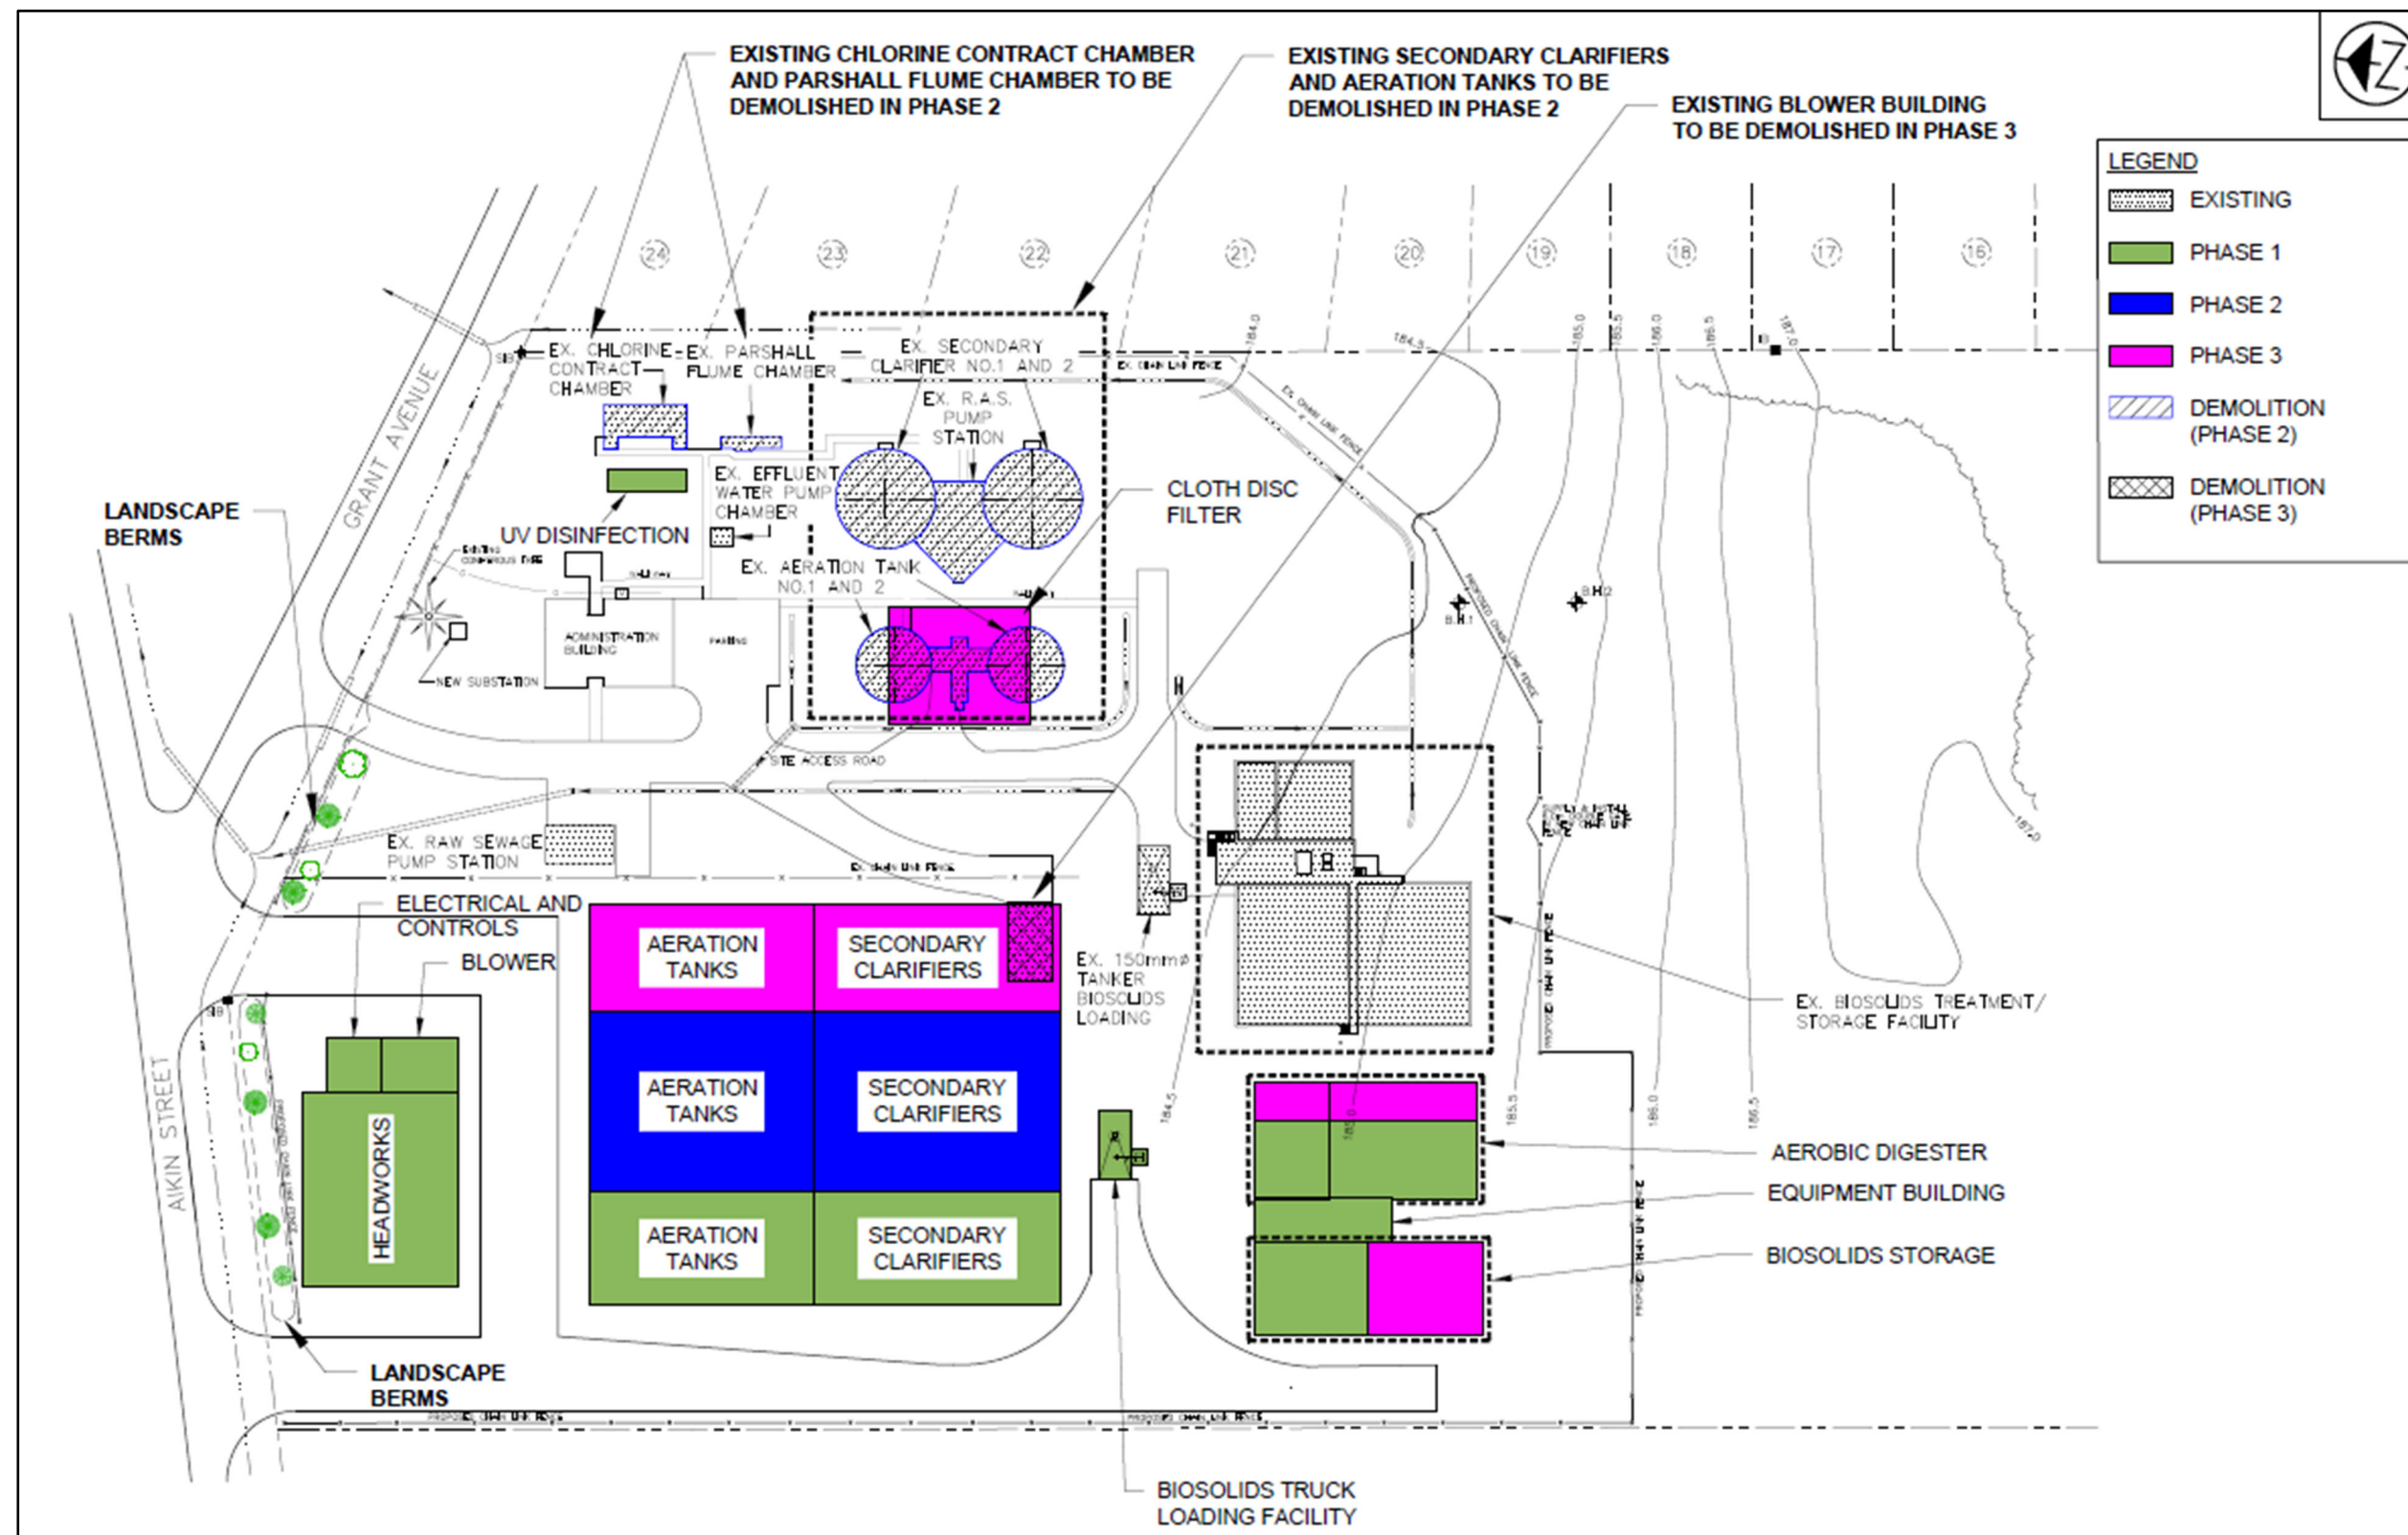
Meaford WWTP Preliminary Site Plan
